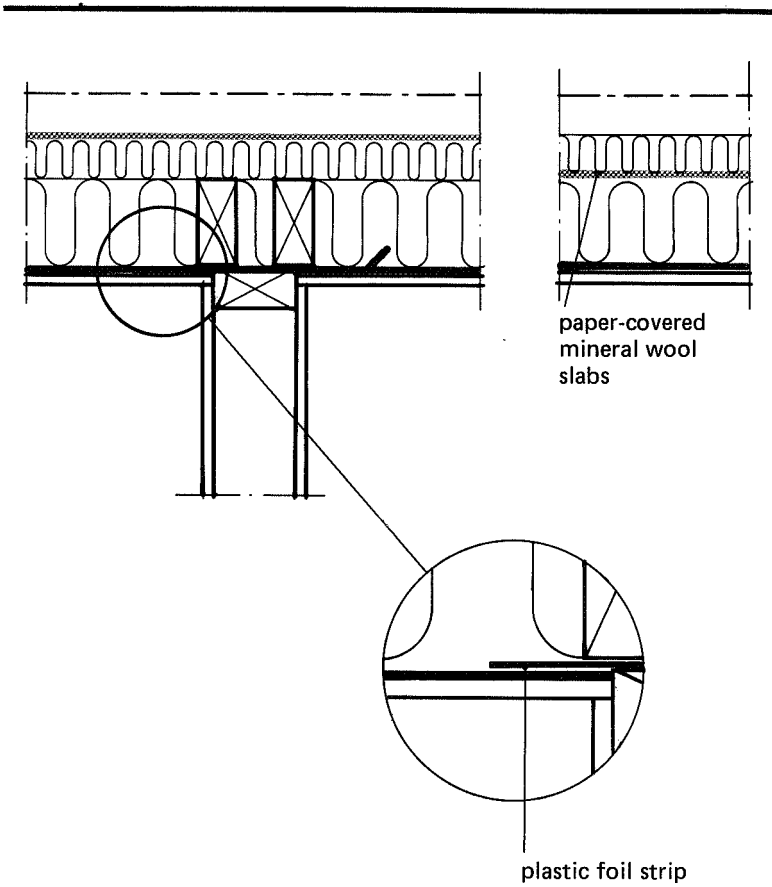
Jointing external walls with internal frame-works and inner walls. Horizontal section. The design assumes that insulation and sealing work is commenced before the internal wall is erected.
